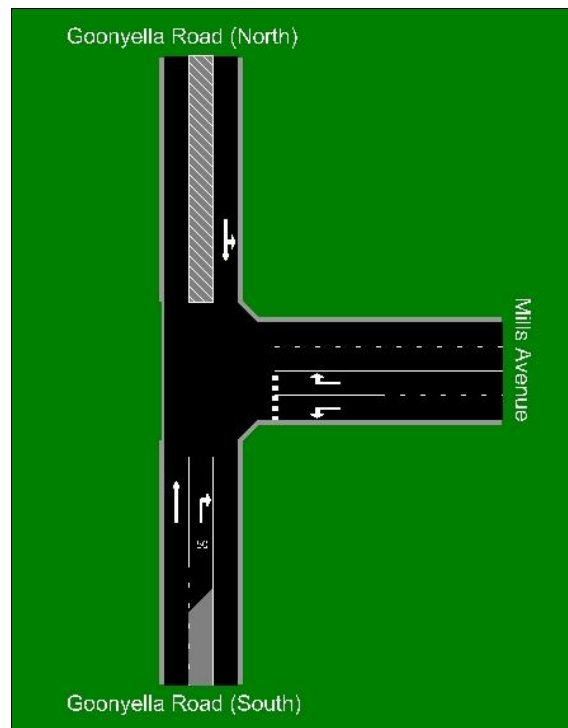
Mills Avenue/Goonyella Road – Intersection Layout
